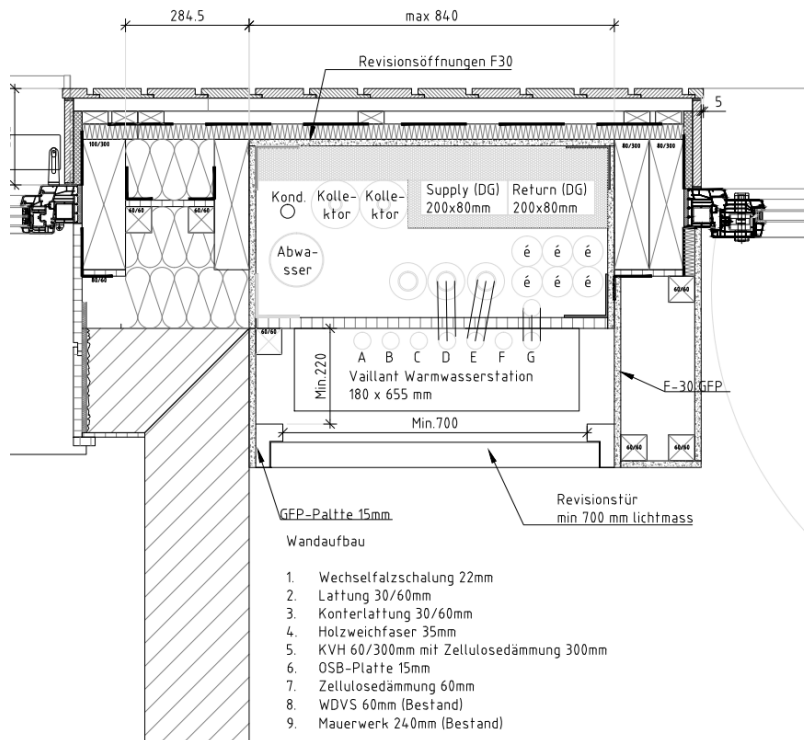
Detail of the prefabricated shaft with all pipes and ventilation ducts of the M&E installation.
